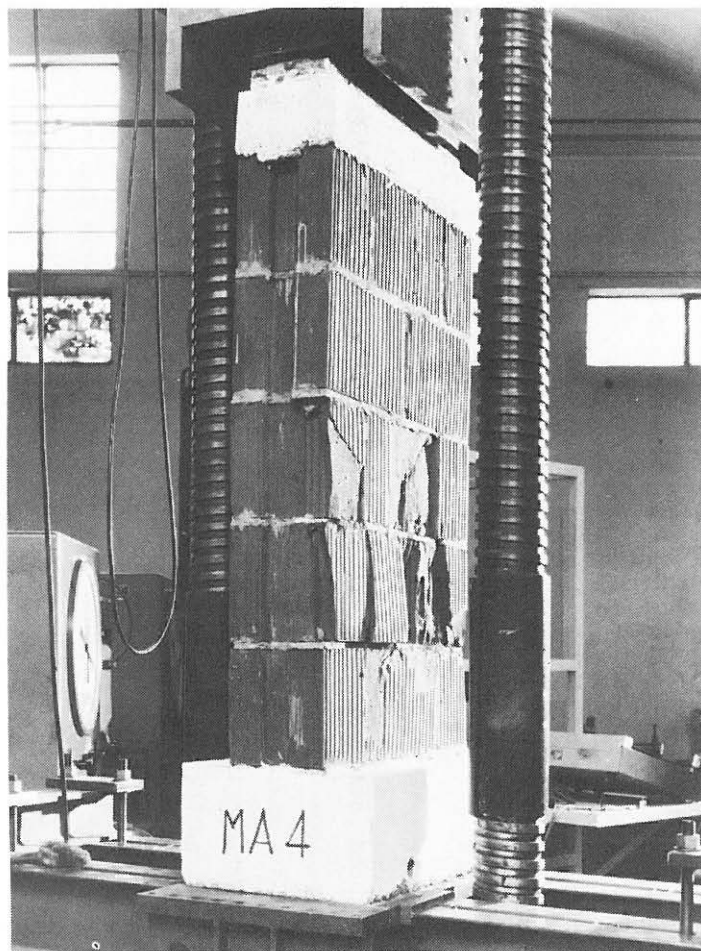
Compression failure with spalling of block outer clay layers
